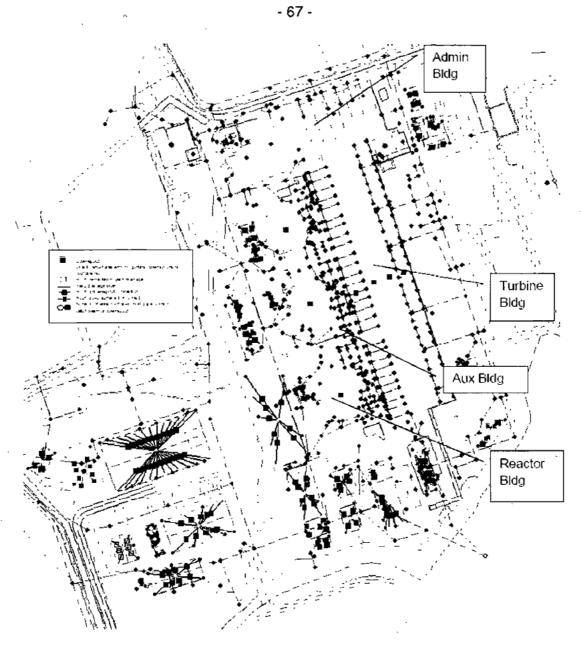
ONS Roof Drainage-To-Yard and Yard Drainage Connection Plan (adapted from the Revised FHRR (Duke, 2015b, Figure A-9))
